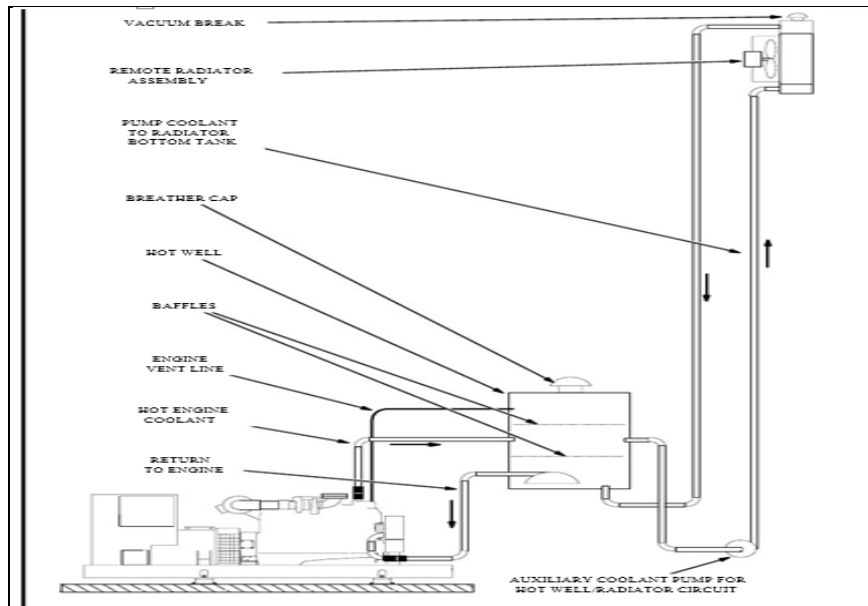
Figure III. Remote Radiator with Hot Well and Auxiliary Pump
